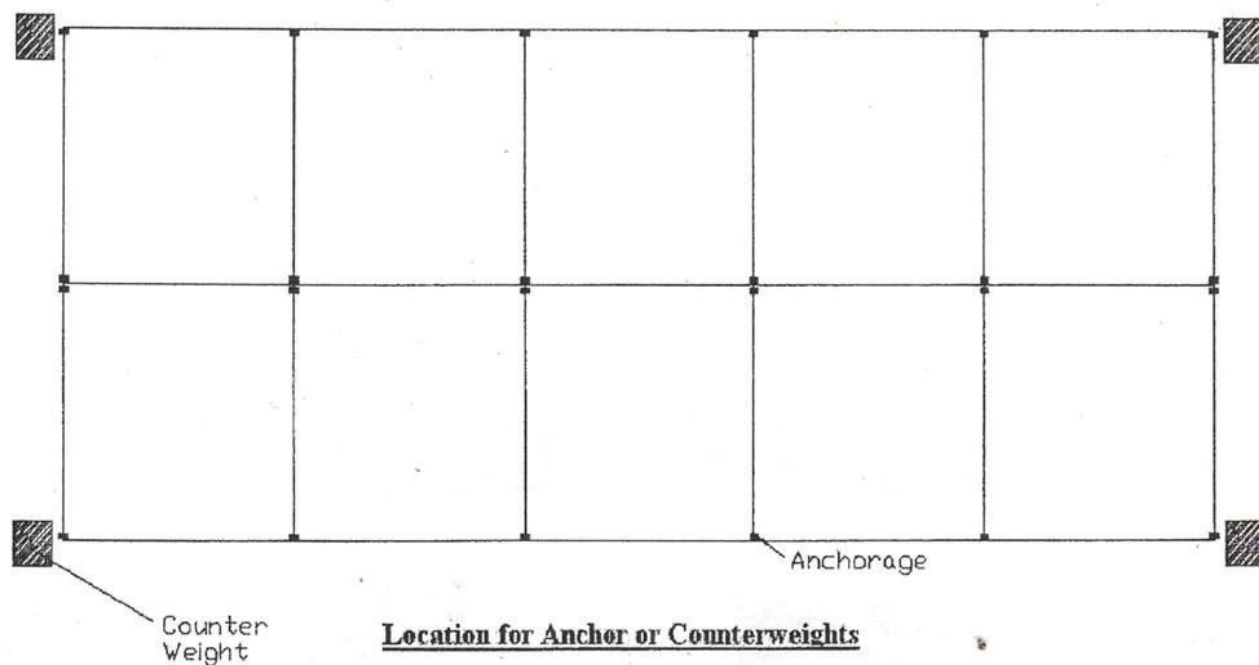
, Suggested Locations if Anchorage or Counterweight Is Used
